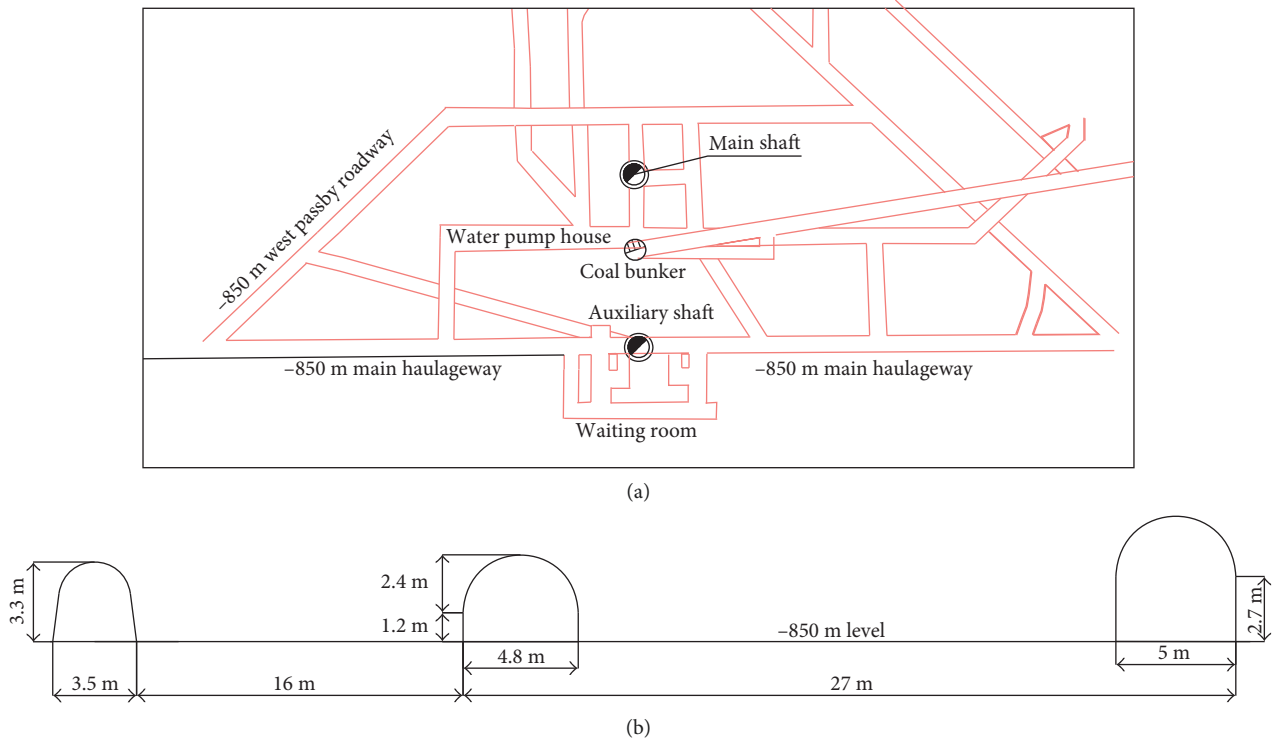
Chamber group layout plan. (a) Shaft station chamber and roadway layout plan. (b) Position relationship of the pump room, transport lane, and waiting room.
